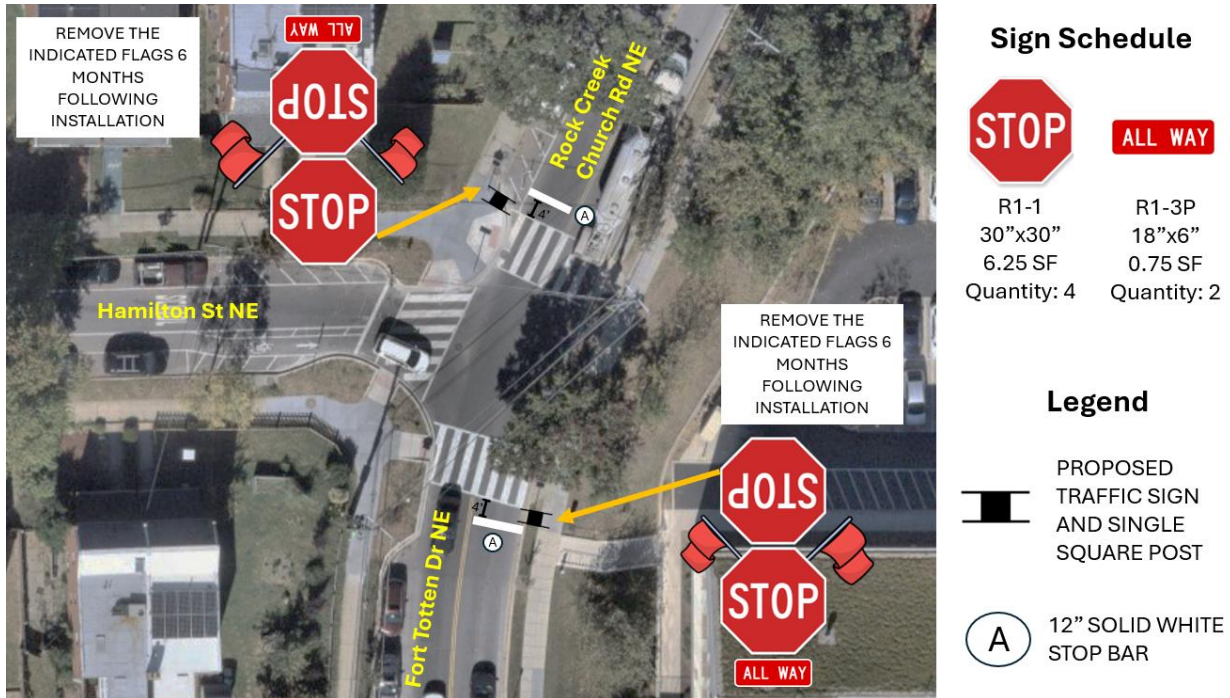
Site plan for installation of double-sided stop signs at the intersection of Hamilton St NE and Rock Creek Church Rd NE/Fort Totten Dr NE.
